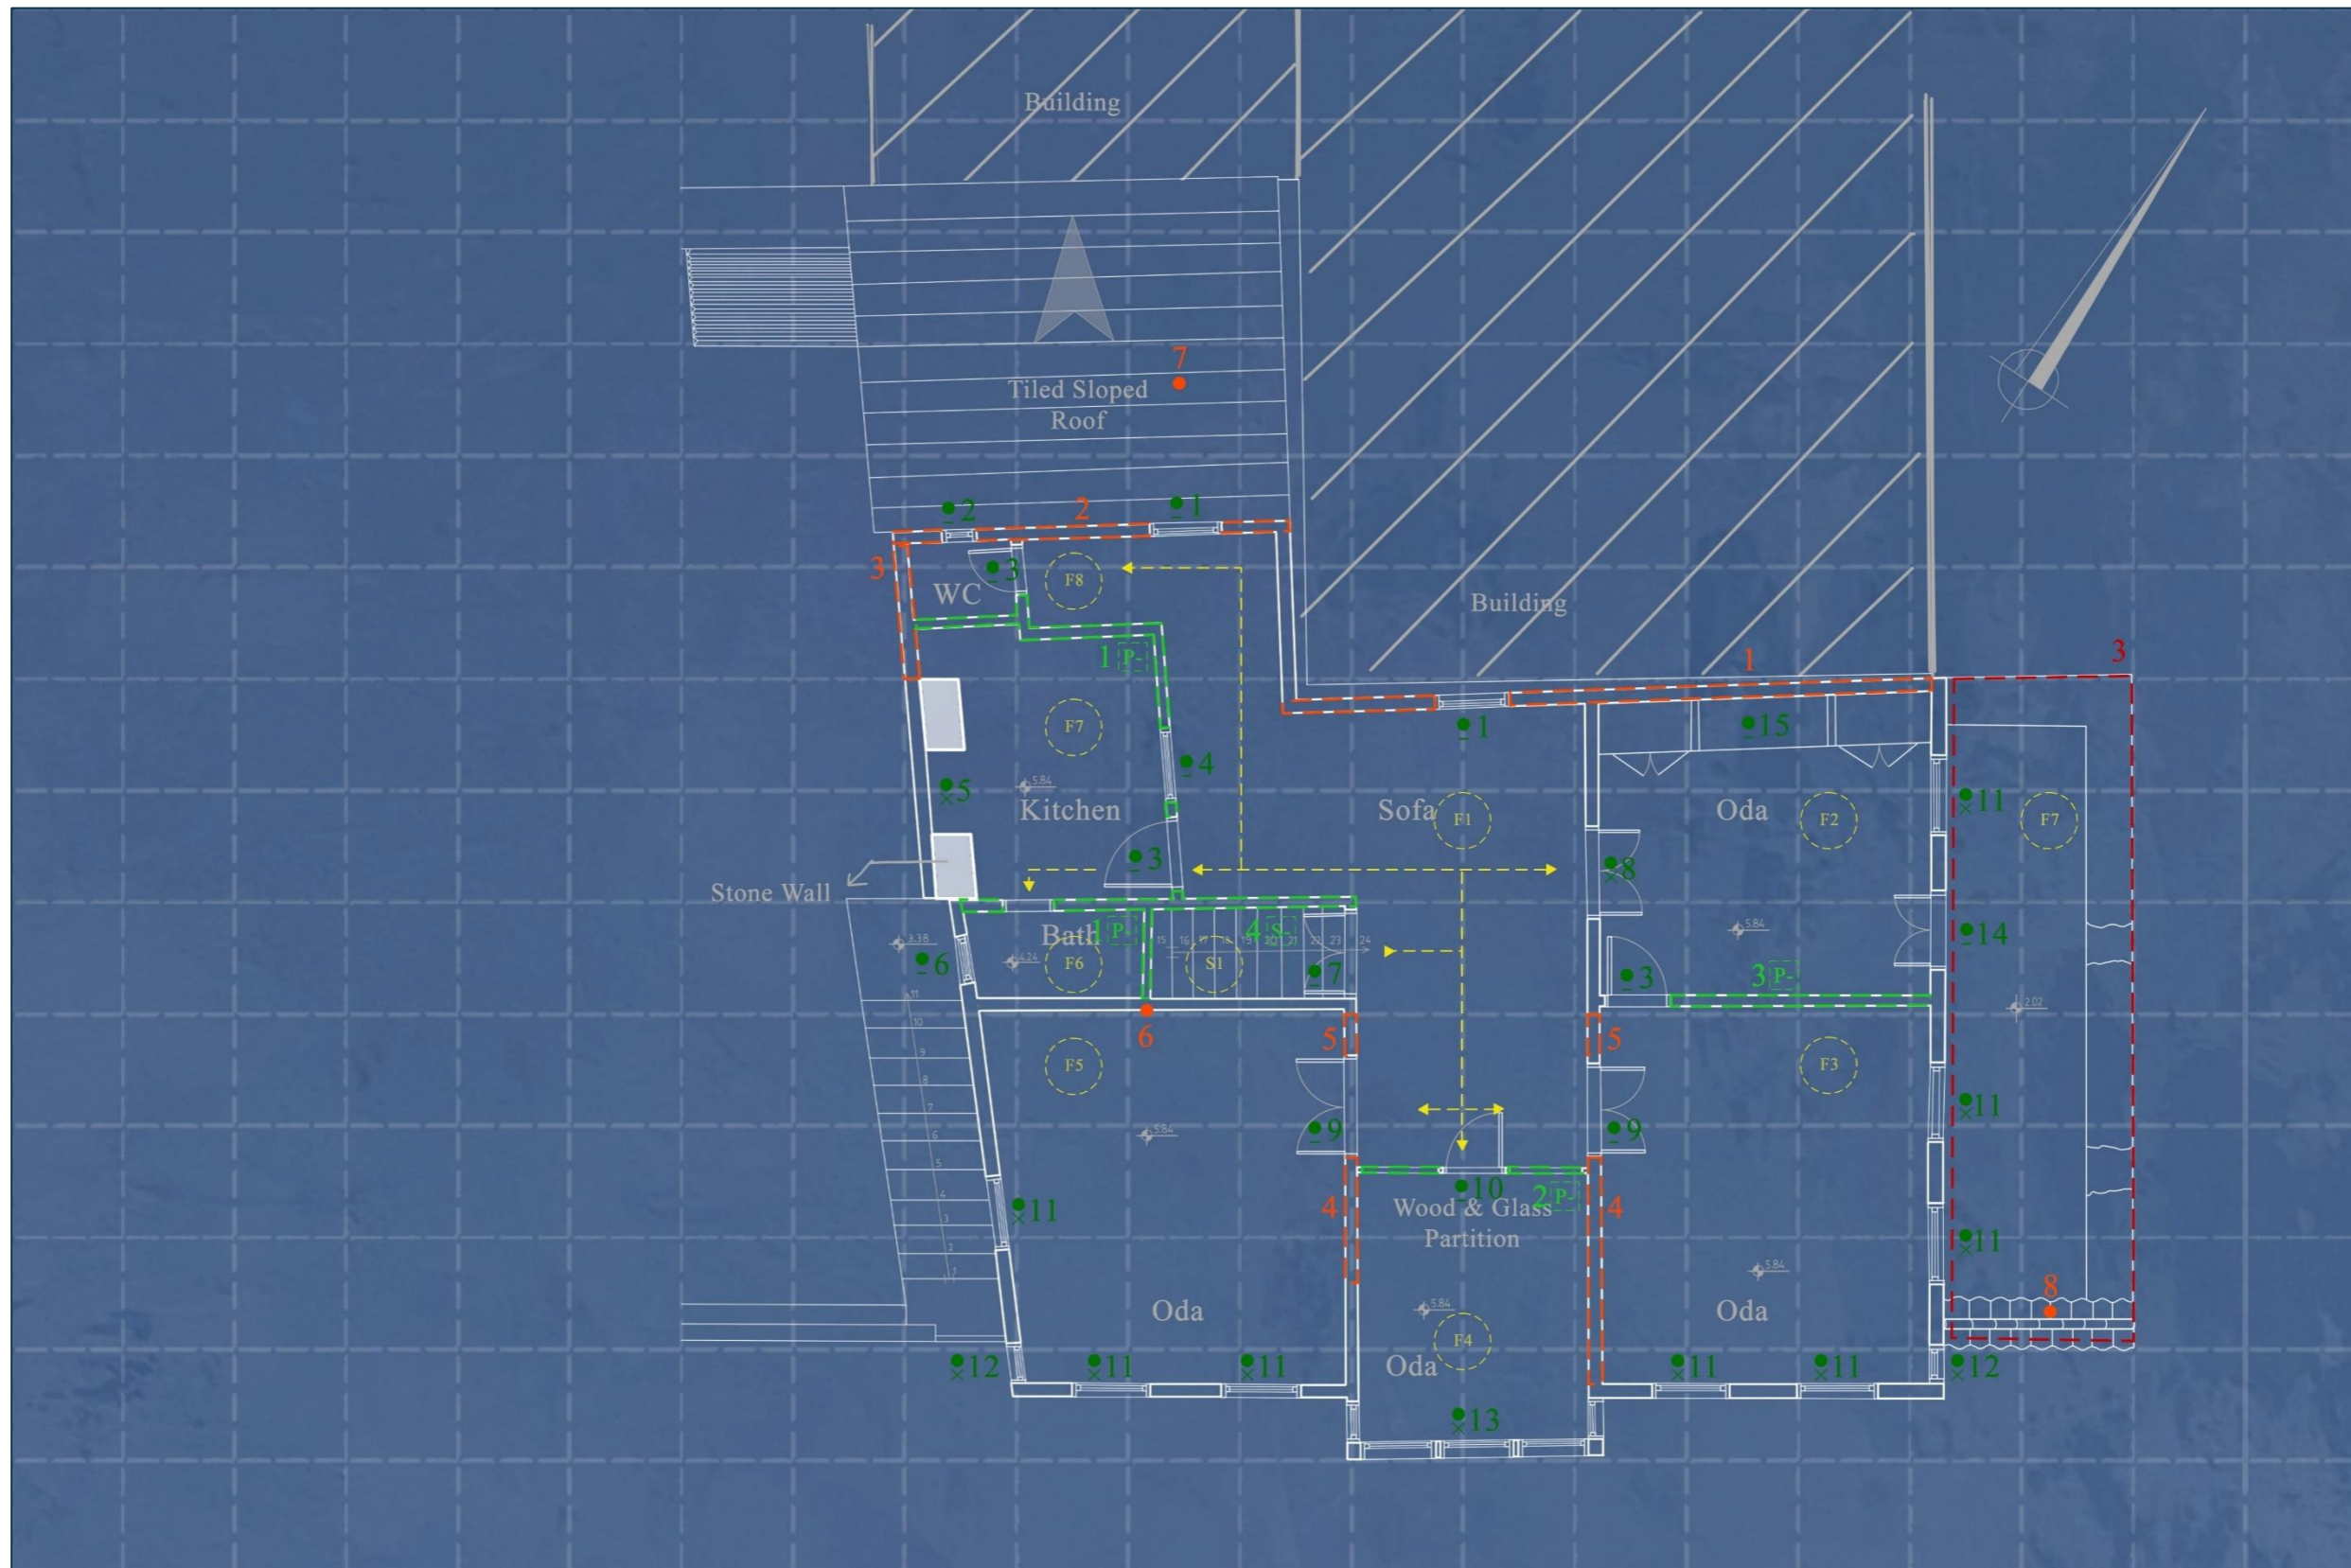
Original first floor intervention analysis plan of Building A. Prepared by the Author.
